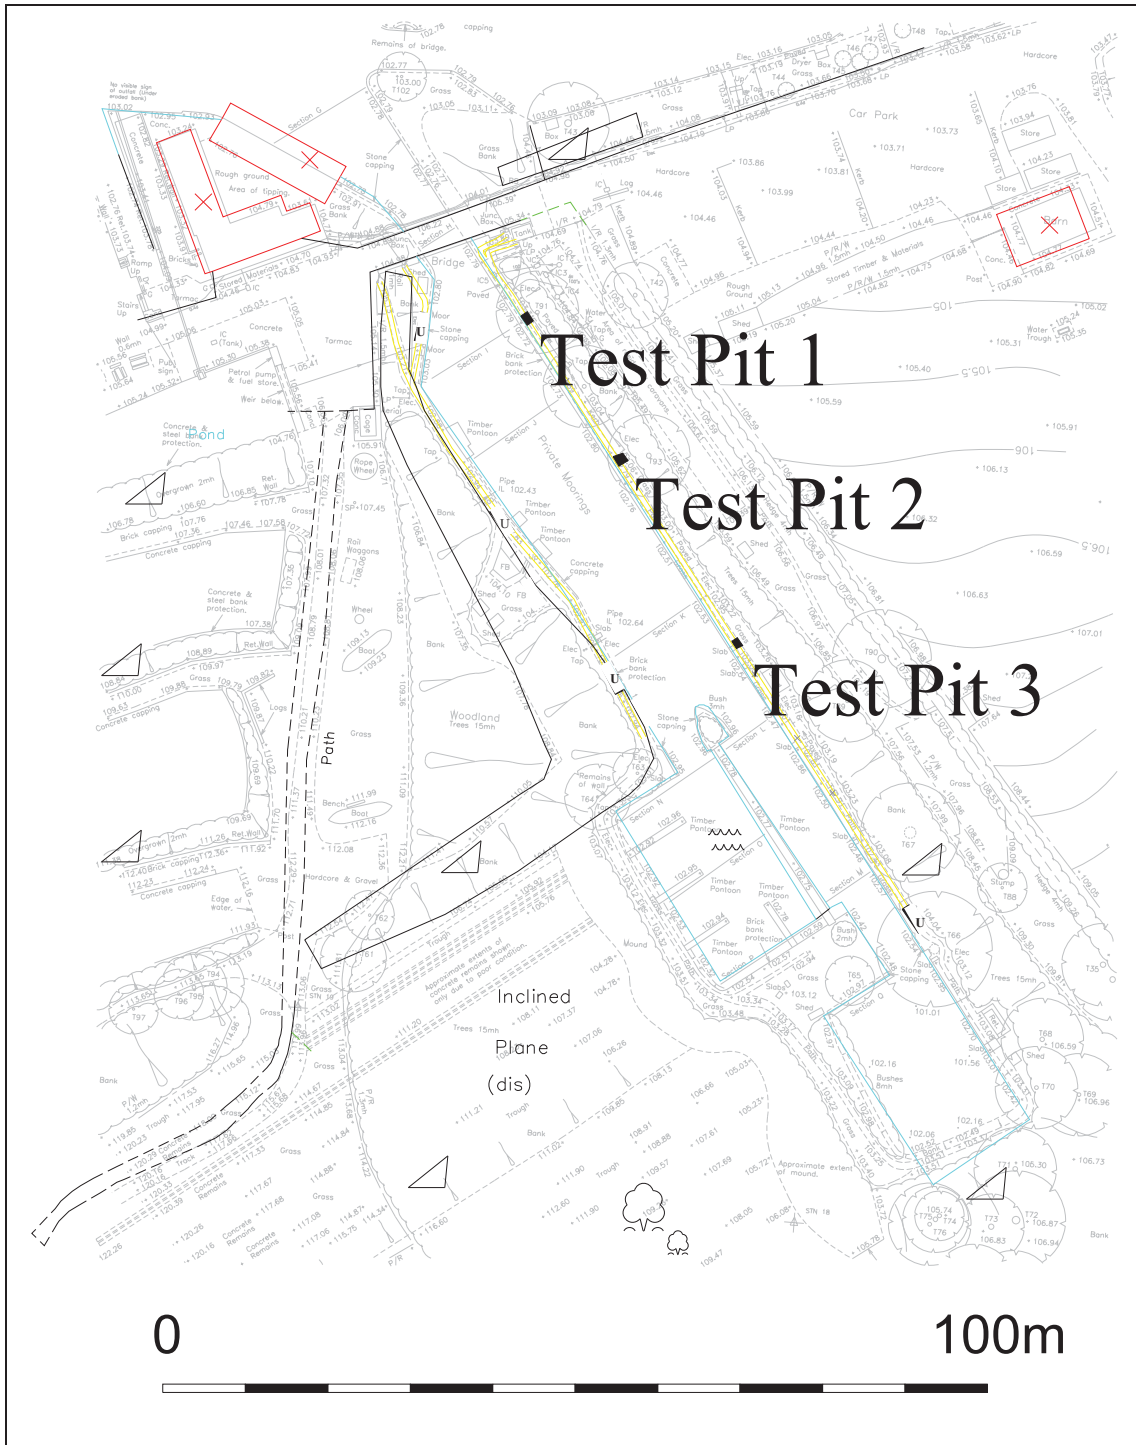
Test Pit Location Plan. U = Test Pit not excavated.
